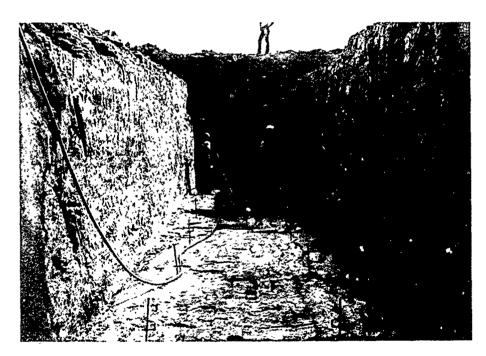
Hydropower conduit - placing gunite, Sta. 29+50-30+00.
